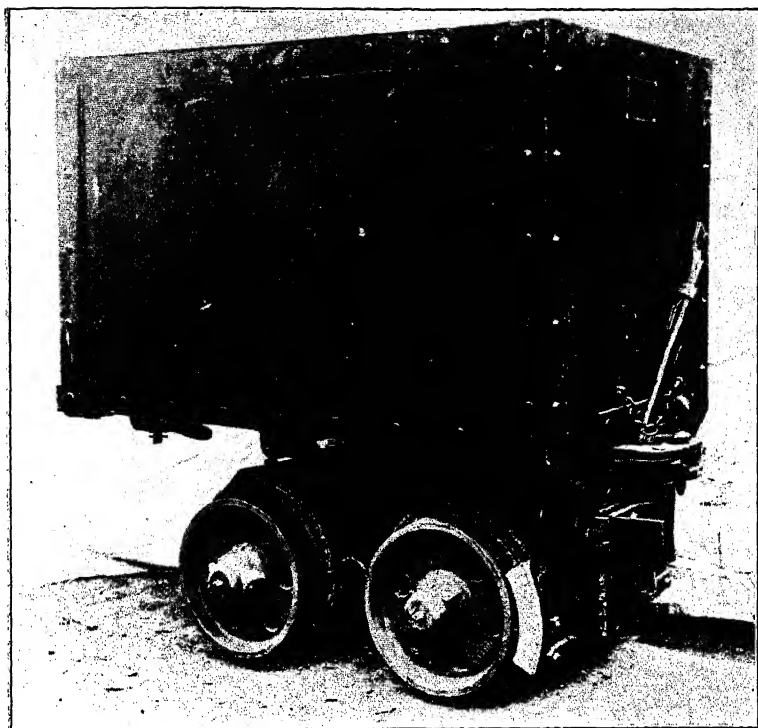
TUNNEL-CAR USED IN CONSTRUCTION OF LARAMIE RIVER TUNNEL.
